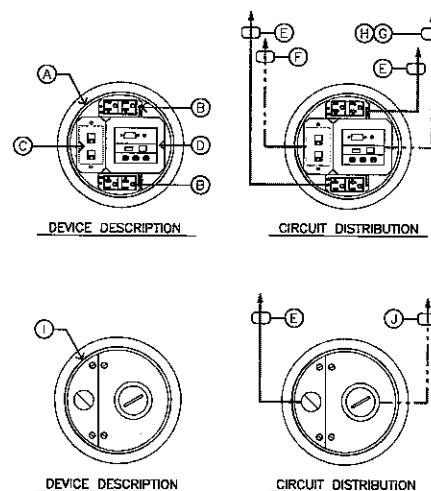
QUAD RECEPTACLE INSTALLATION N.T.S.
